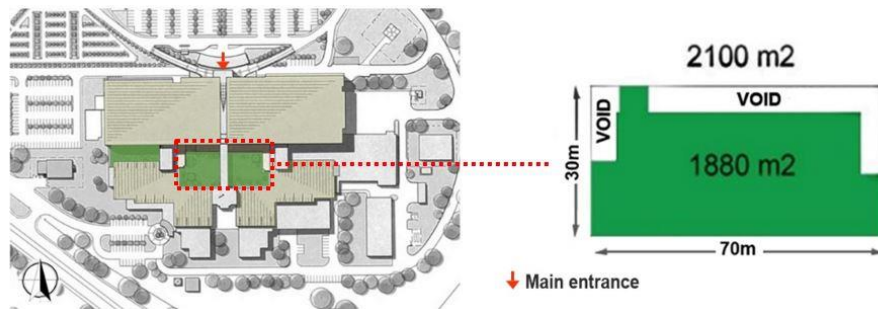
H1-C1- Site plan indicating the location of the case study site
